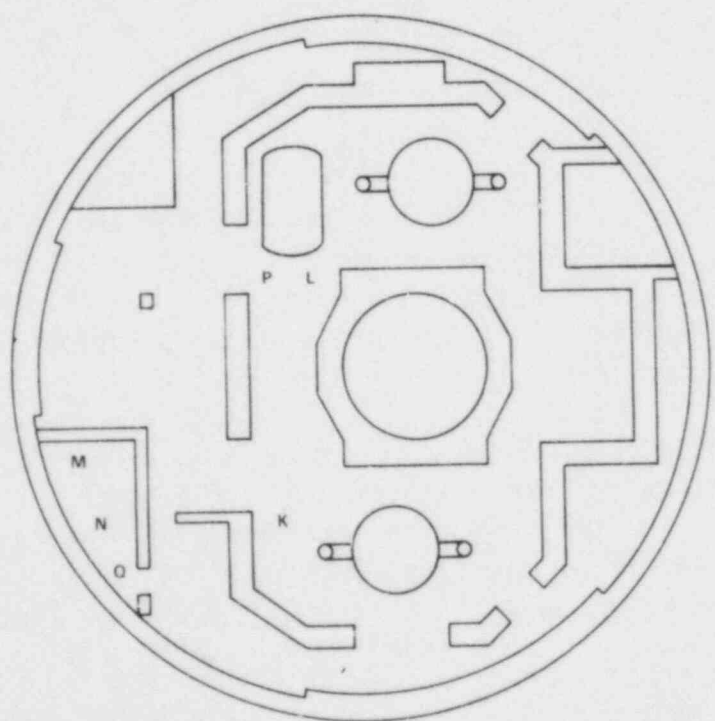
Containment Layout at the 336-ft Elevation, Site B. Measurements were performed at the locations indicated.
